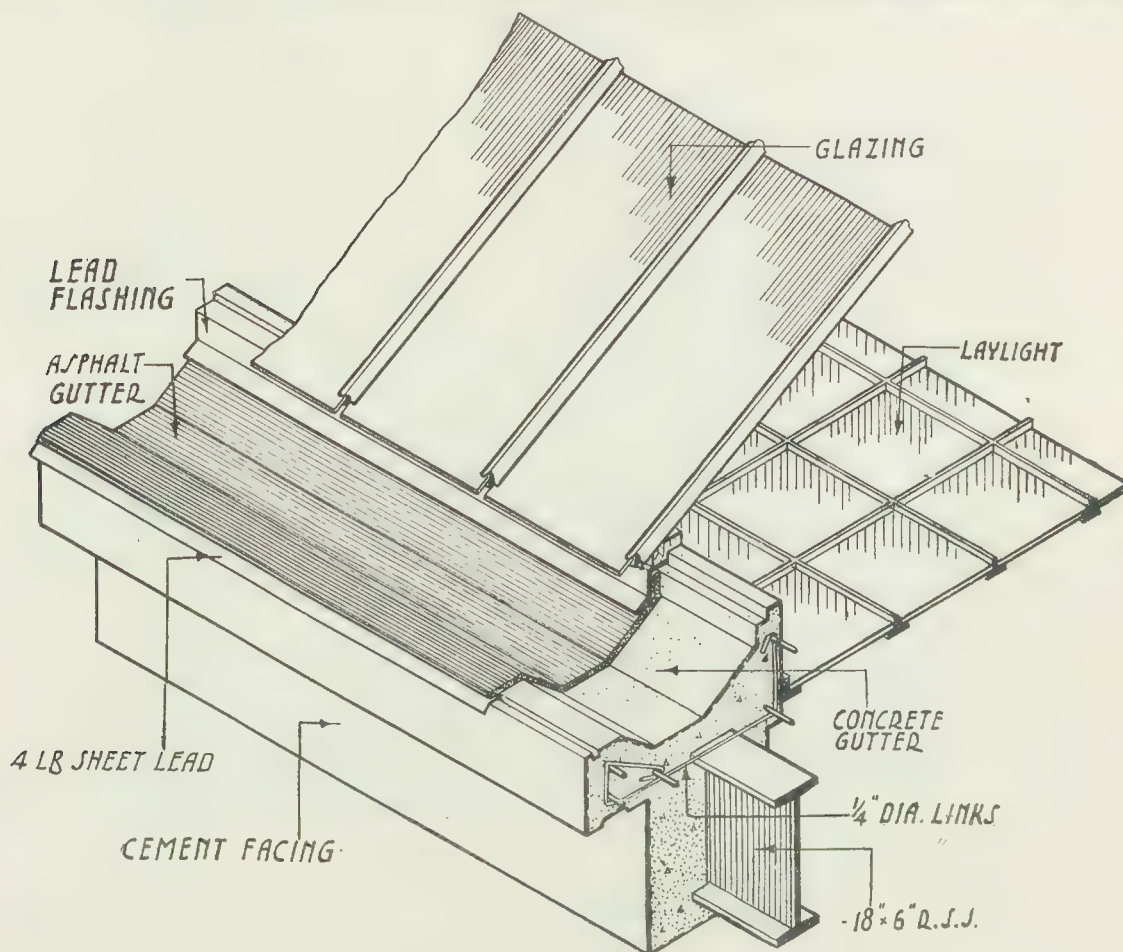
CONSTRUCTION OF METAL FRAME LAYLIGHT UNDER A GLAZED ROOF LIGHT
